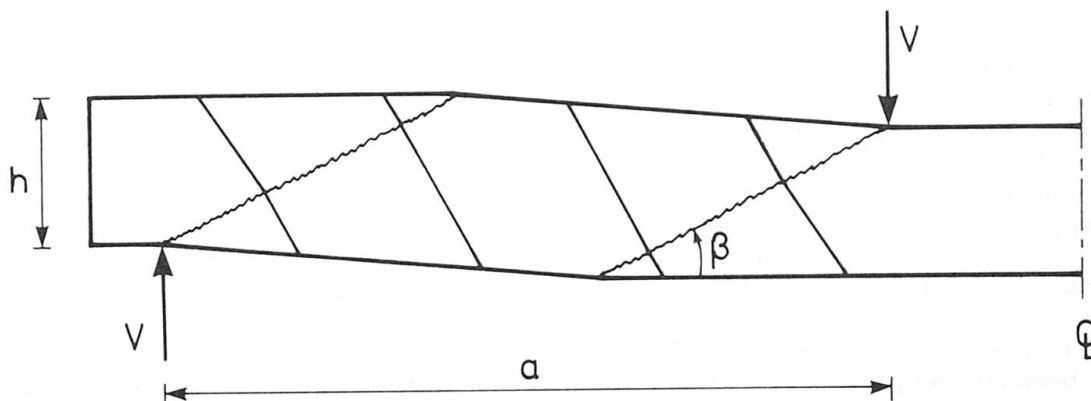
Shear failure mechanism for reinforced concrete beam
